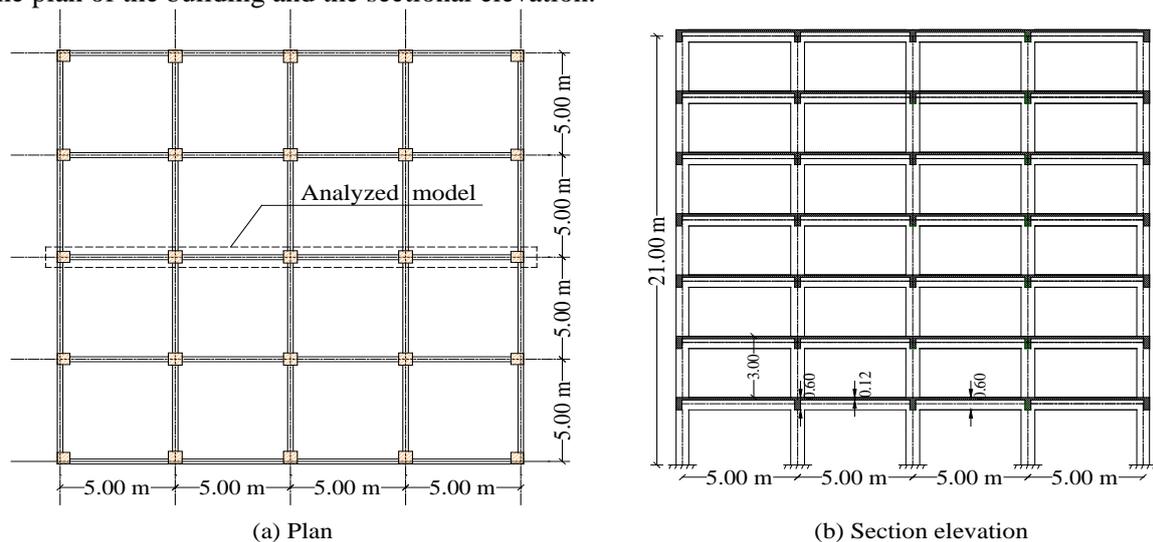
Plan and elevation of Regular R/C frame buildings
